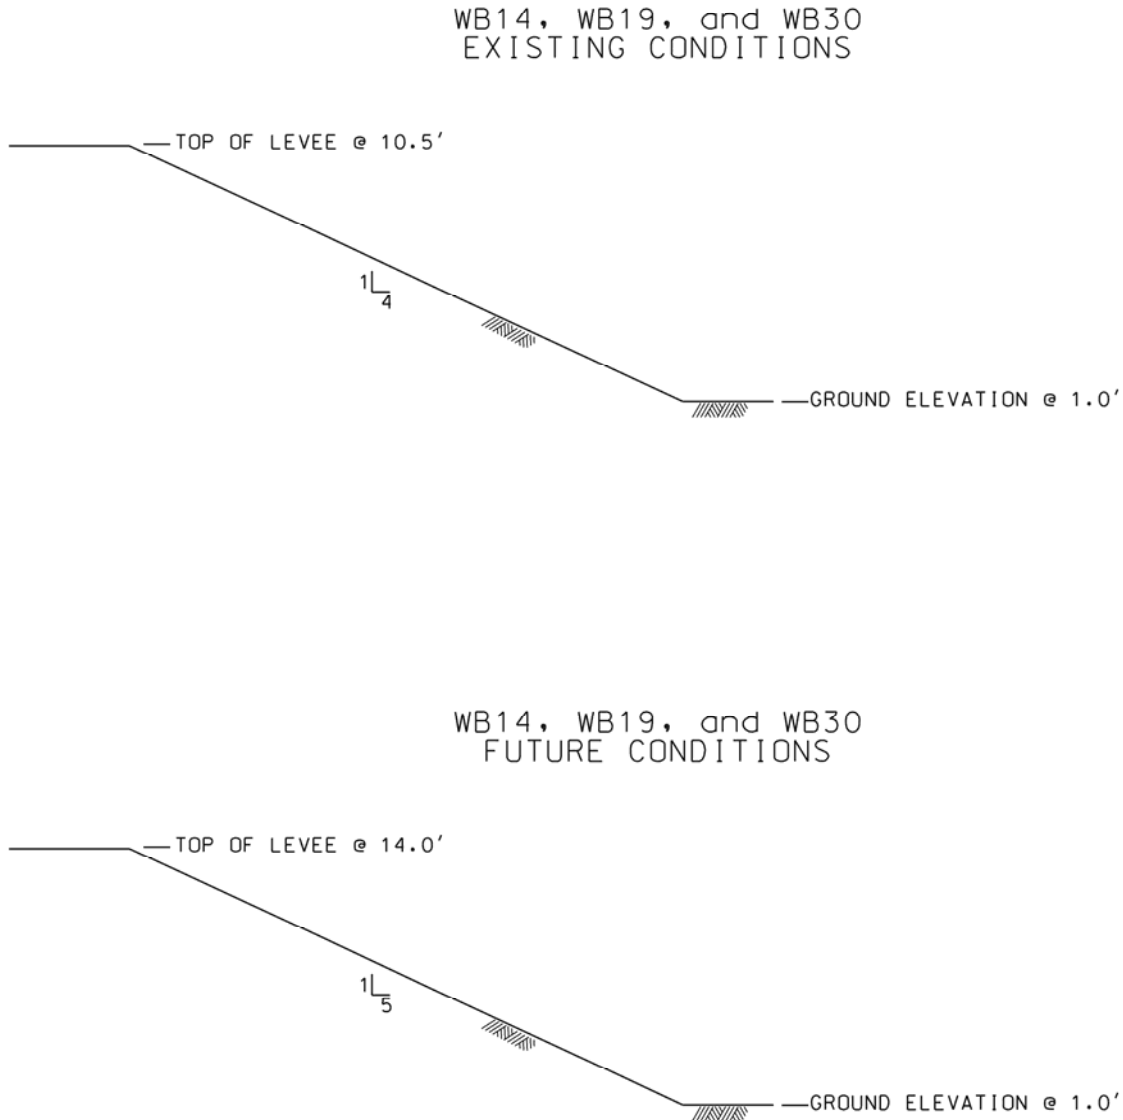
Typical Design Cross Section for the levees along Harvey Canal (WB14), Algiers Canal (WB30) and Hero Canal (WB19) for existing conditions (upper panel) and future conditions (lower panel).
